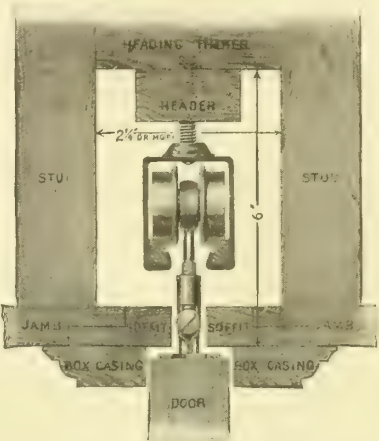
CROSS-SECTION VIEW SHOWING APPLICATION OF NO. 221 "ADVANCE" PARLOR DOOR HANGER
